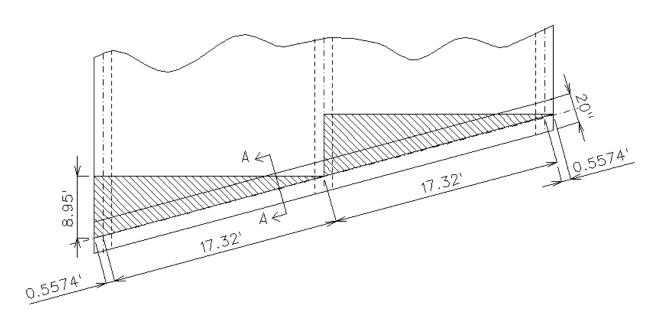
Partial plan view of double box culvert showing hatched area where dead loads are considered
